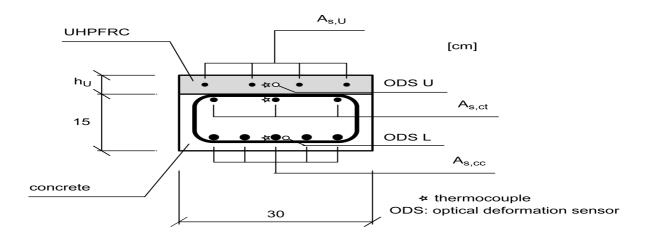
Cross-section of the composite "UHPFRC-concrete" beams [13]
